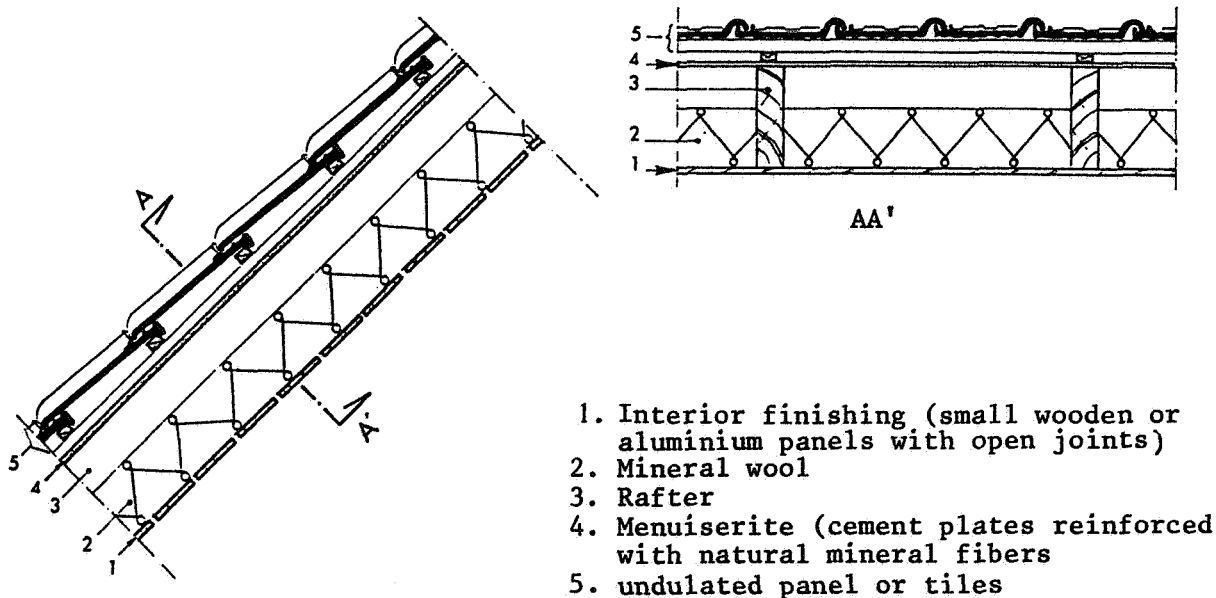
Typical cross section of an inclined roof with very poor airtightness [7].
